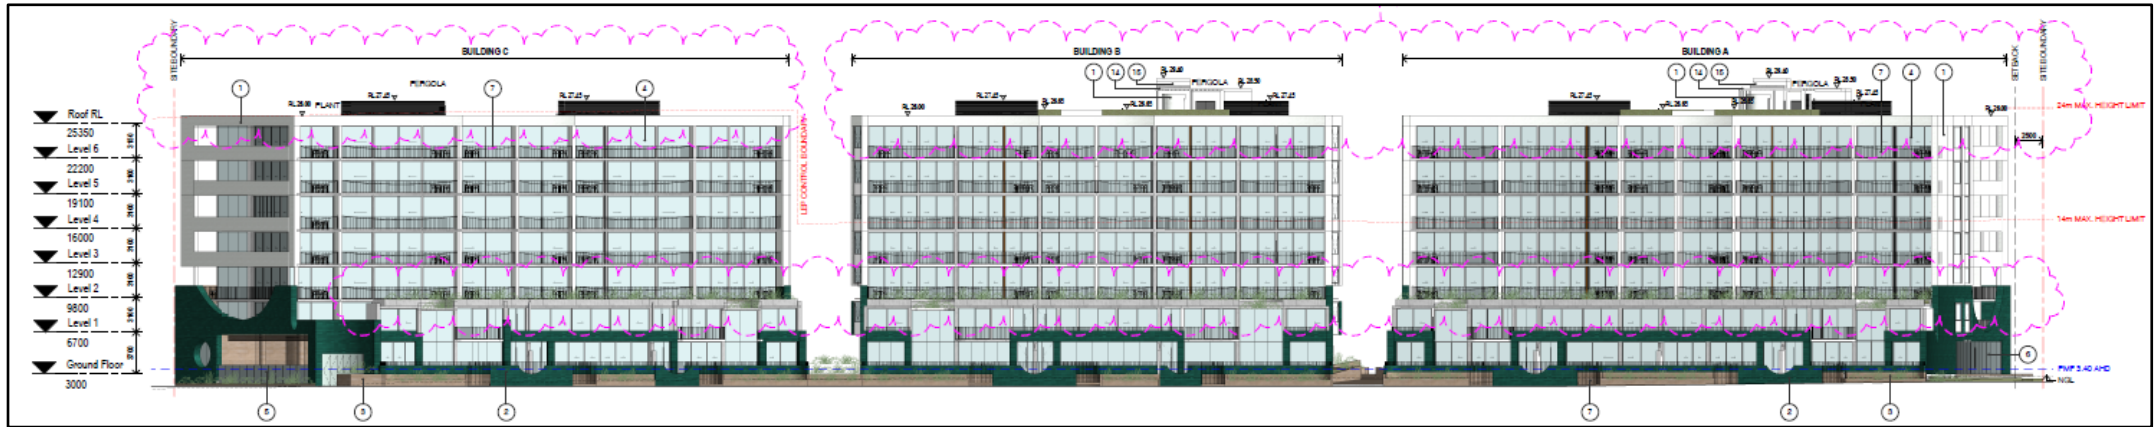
| Proposed Northern Elevation Plan (Source: DA-0501 Revision 17 dated 15.05.19)
